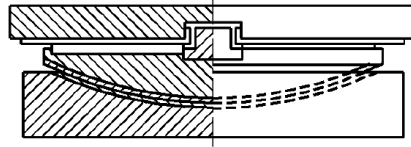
Assembly of a guided and free movable VSLide spherical bearing.
